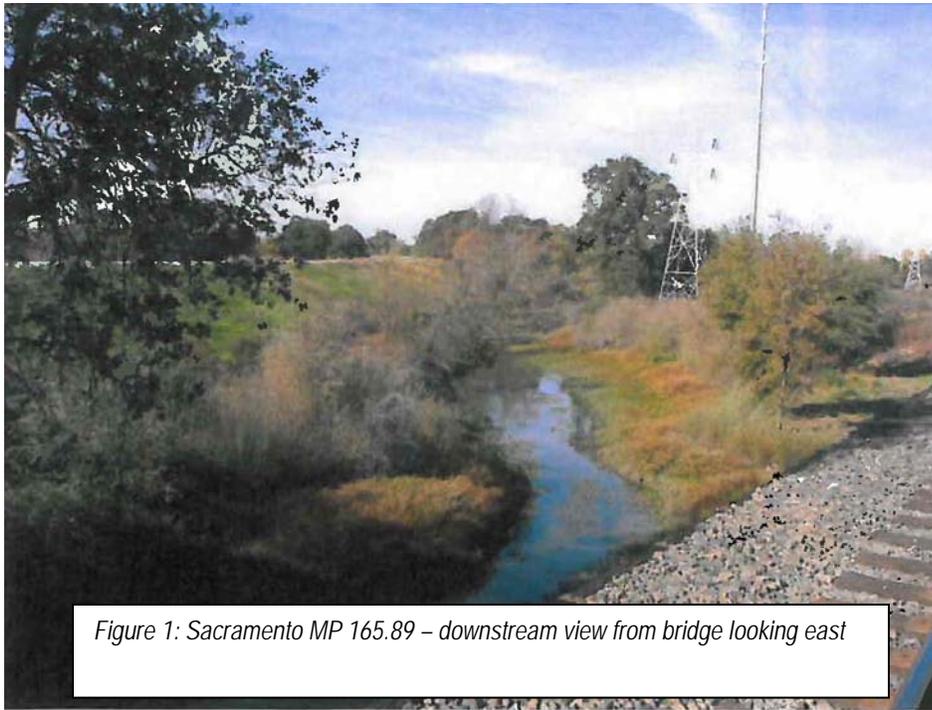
Sacramento MP 165.89 – downstream view from bridge looking east
